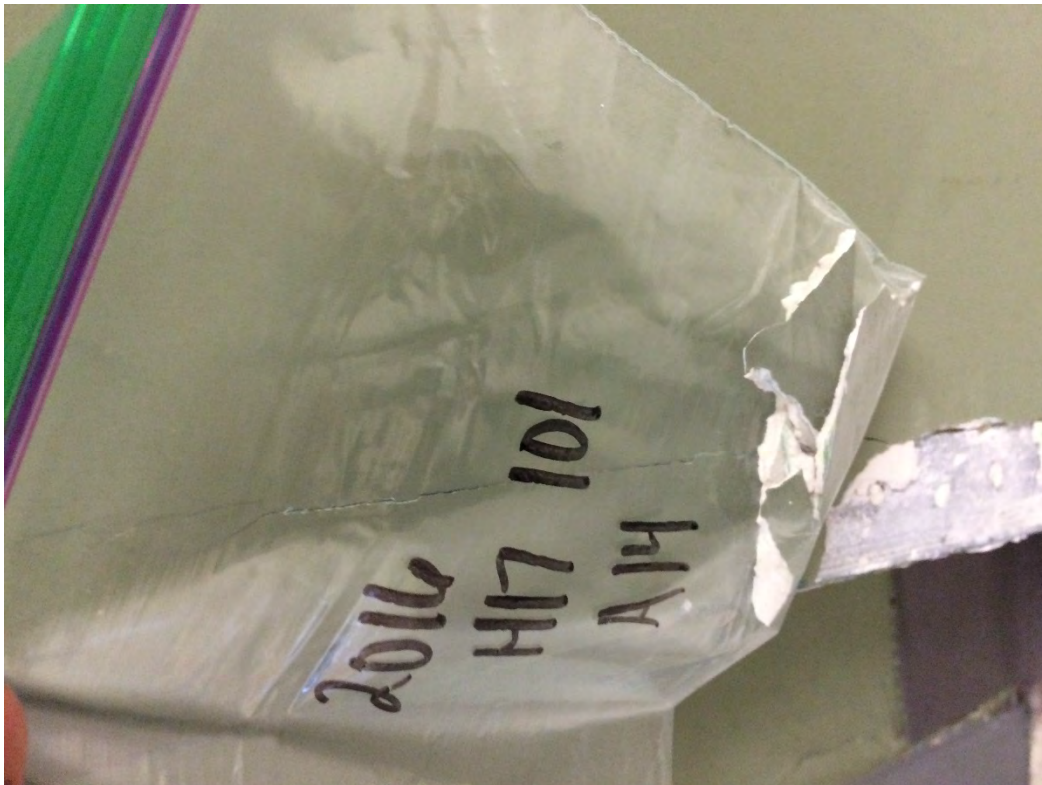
Asbestos sample A14, drywall joint compound collected from wall in H17-101. No asbestos detected.
